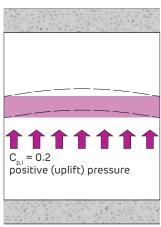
Typical Simplified Wind Pressure Coefficients for Internal Wall Frame Design
